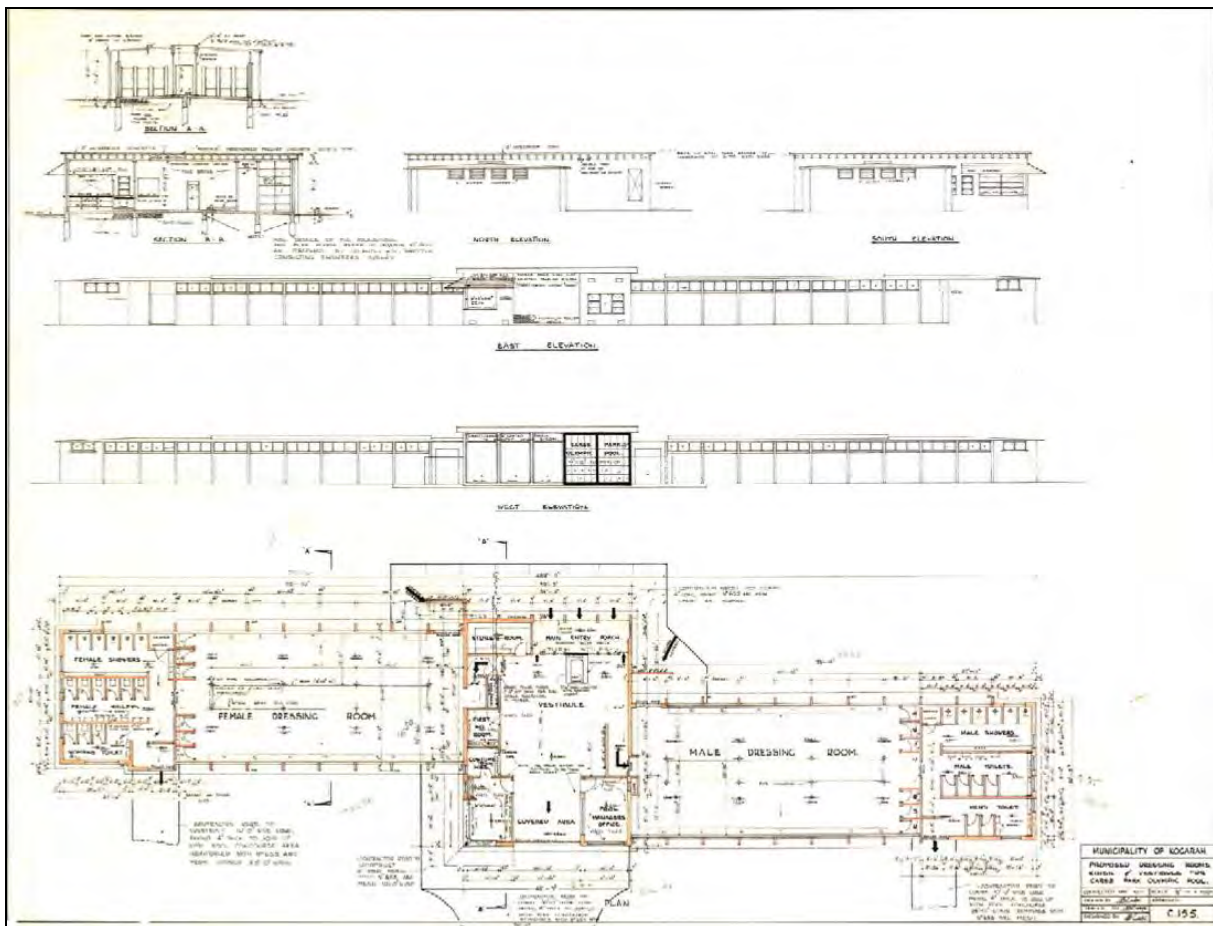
Detail plan showing the proposed layout and elevations of the proposed Dressing Sheds and facilities. (Georges River Council, Plan No. C155)
